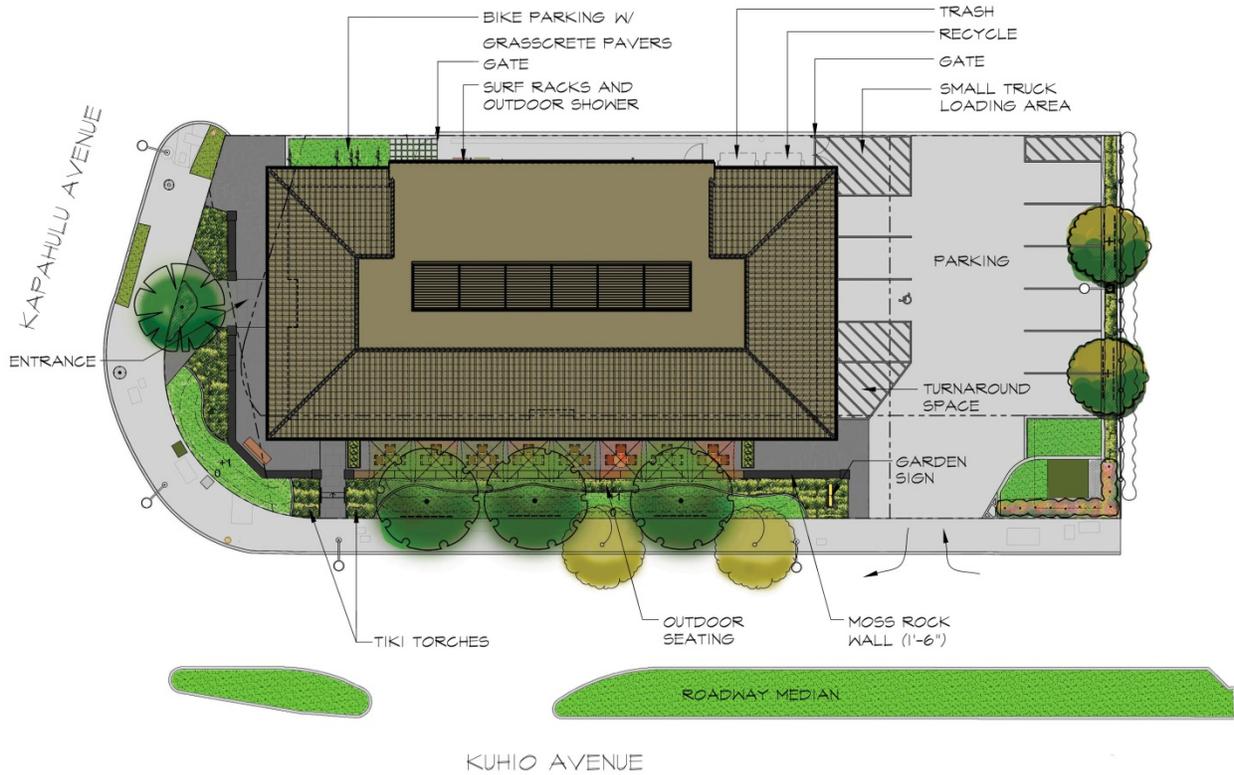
Location of 208 Kapahulu Avenue/2583 Kūhiō Avenue Restaurant/Retail Building Site
